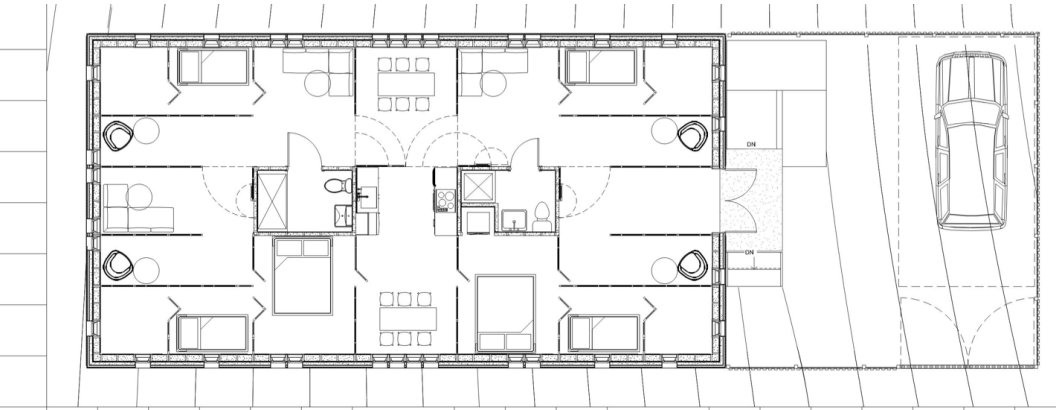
First Floor Plan, Option 2, 6 Bedroom
